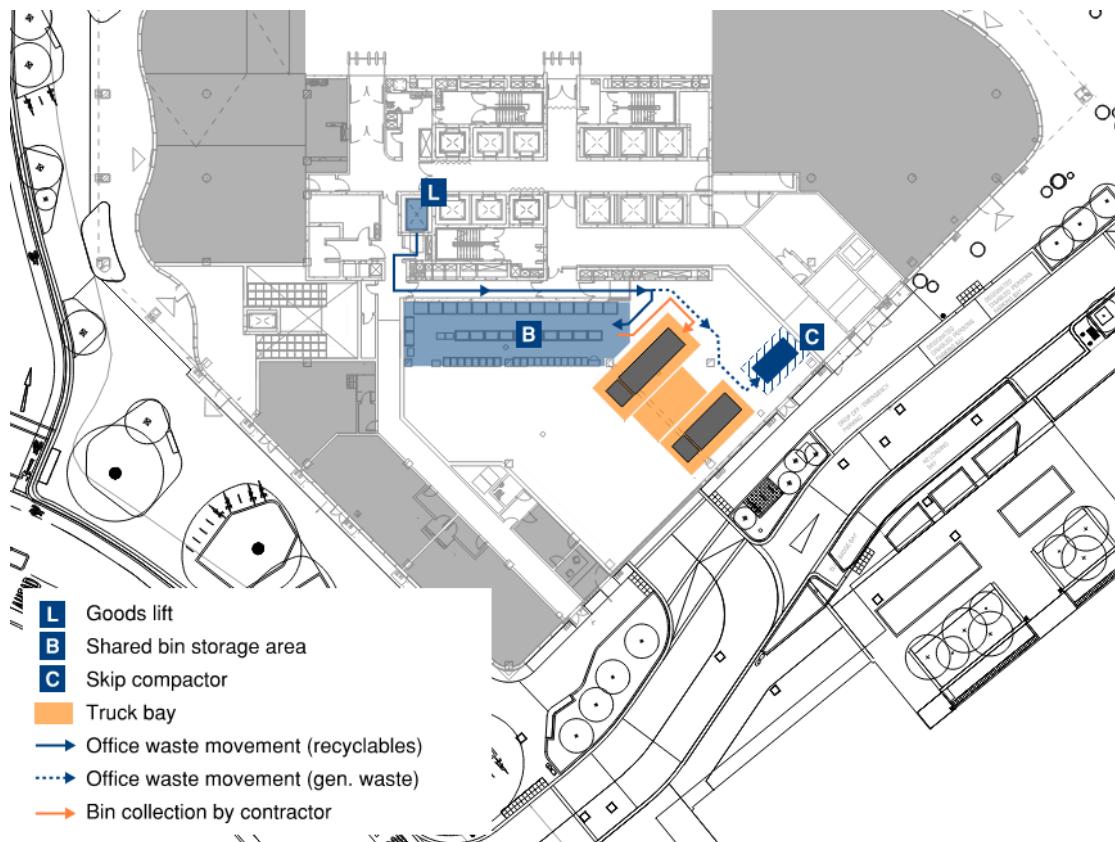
Ground floor back-of-house areas showing the office centralised bin store and waste movement routes
